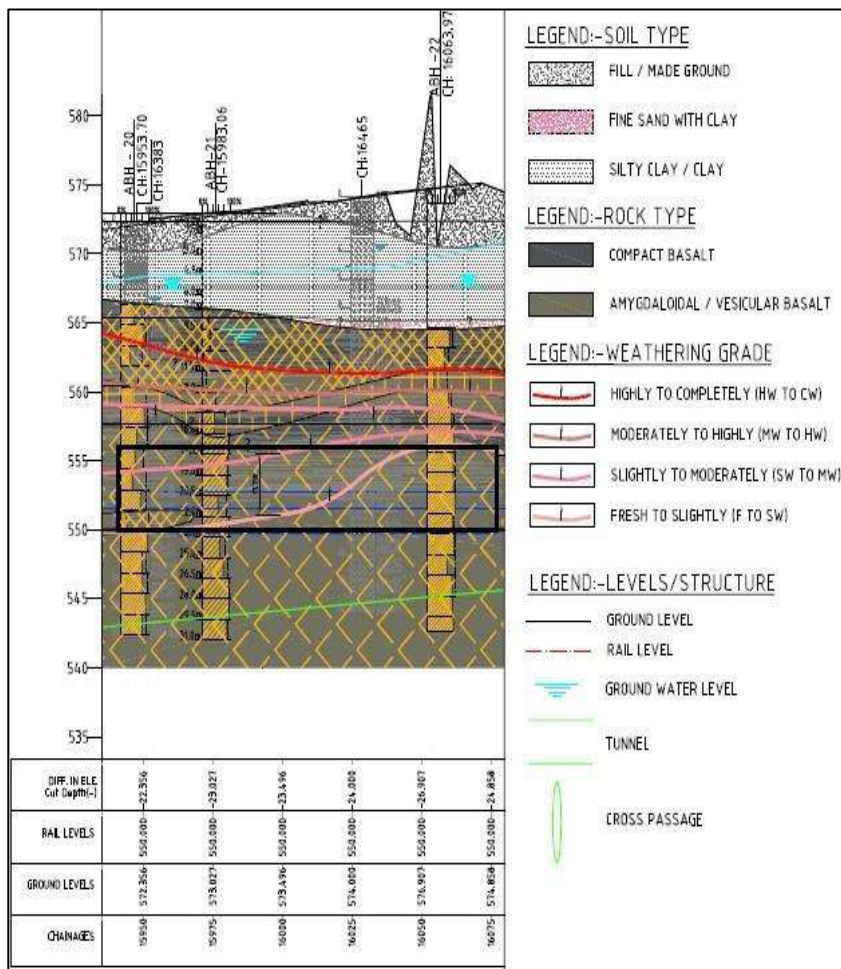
showing the geological L-section of crossover tunnel, Swargate
